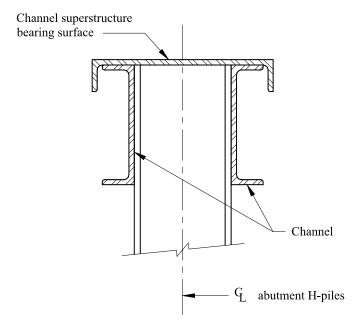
Alternate steel channel pile cap detail for a steel H-pile abutment.
